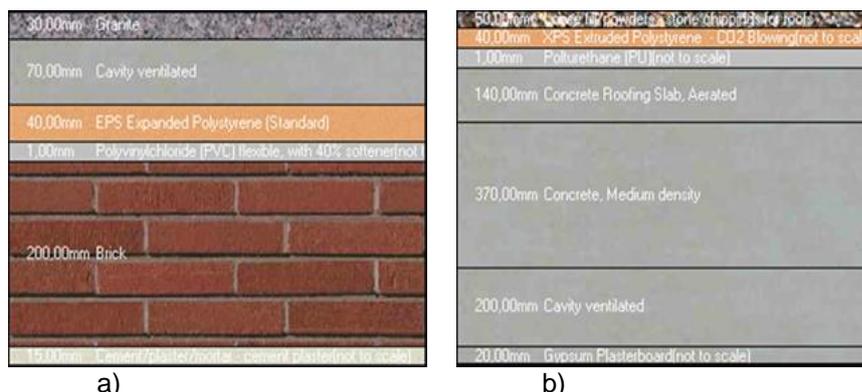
Composition of wall façade (a) and ceiling (b) of computer rooms.
